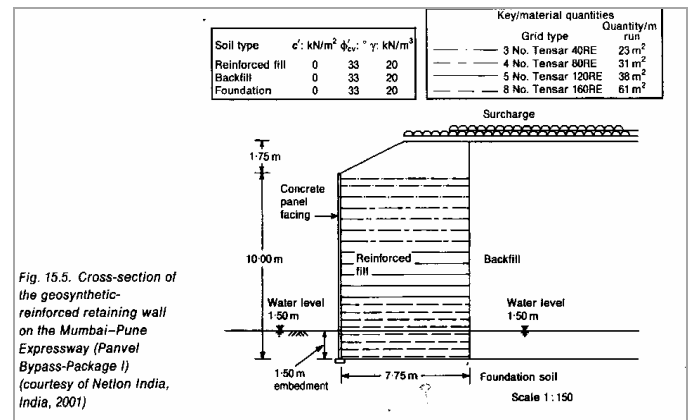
(c). RE wall Mumbai – Pune Highway Depth of Foundation 1.5 m (Netlon India, 2001)
